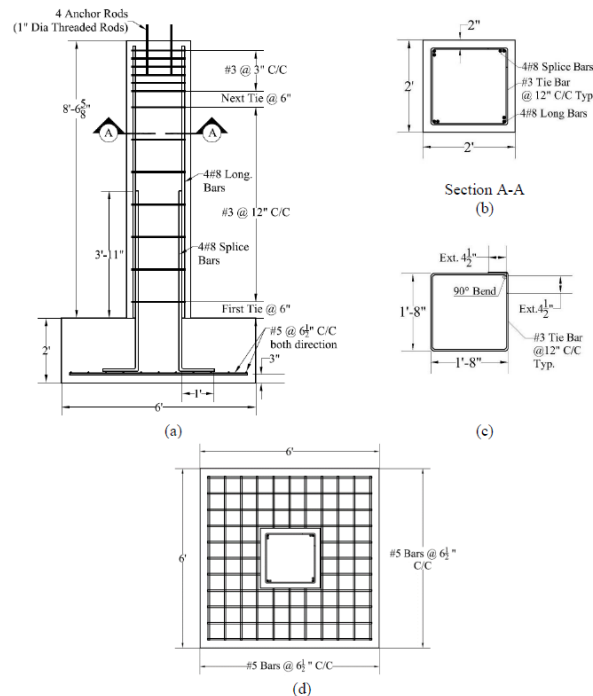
(a) Column-footing longitudinal section details (b) Column cross sectional details (Section A-A), (c) Tie bar details, (d) Foundation cross section details
